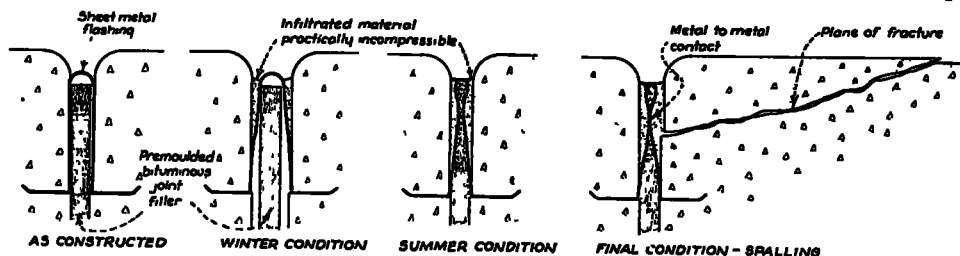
Progressive Infiltration of Foreign Materials, Flashing Collapse and Ultimate Spalling
